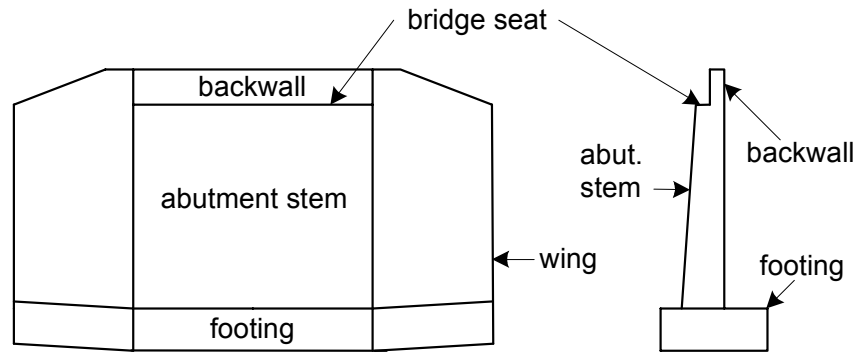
Cantilever Abutment (or Full Height Abutment)
